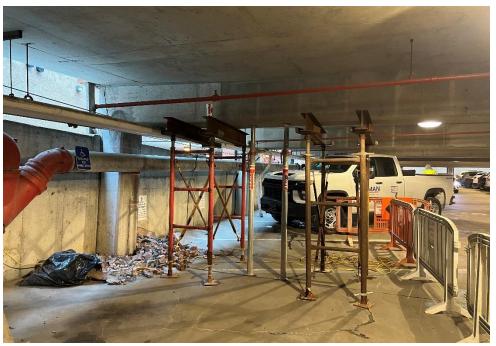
Shoring installed at the west end of the Level 1 beam supported by Column 11A.
